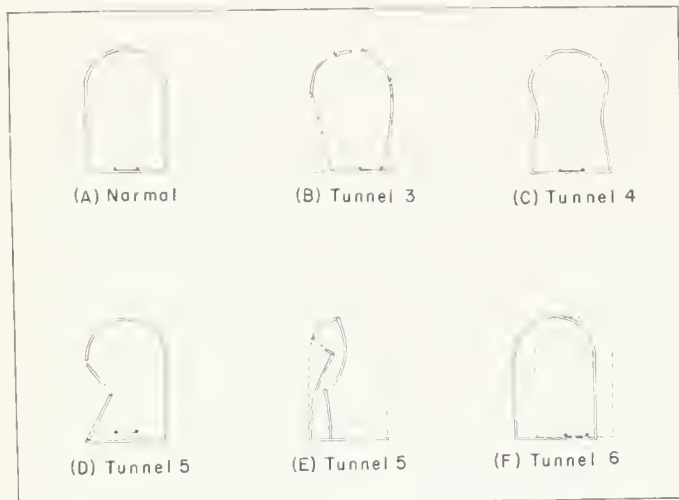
Typical tunnel cross sections to show results of earthquake damage. All sections drawn looking along track toward Tehachapi.
